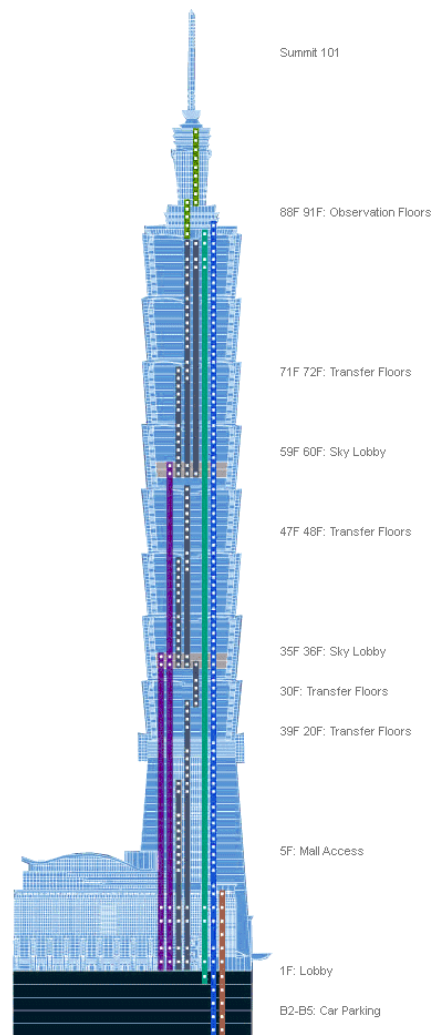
Elevator system of Taipei 101 (<http://www2.taipei-101.com.tw/>).
